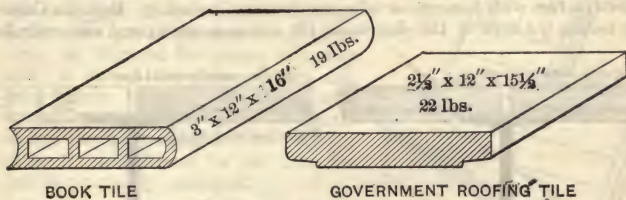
Hollow Book-tile and Solid Tile for Roofs
